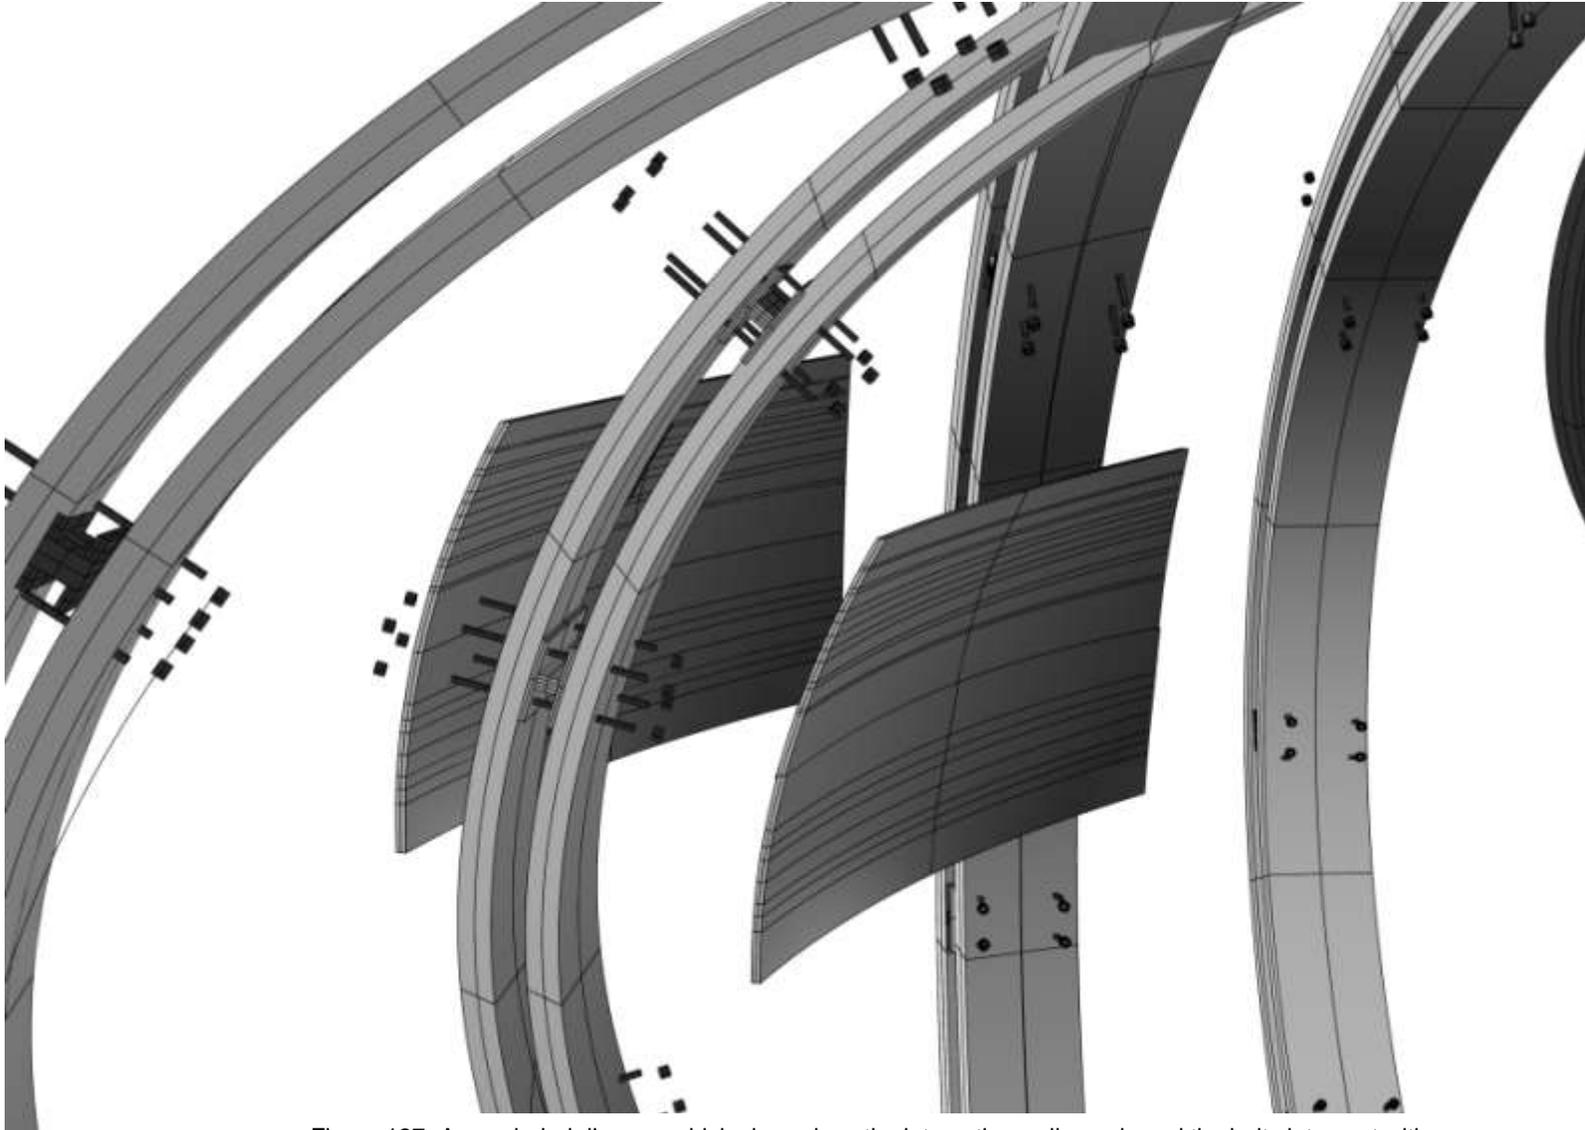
An exploded diagram which shows how the interactive wall panels and the bolts intersect with the design structure
